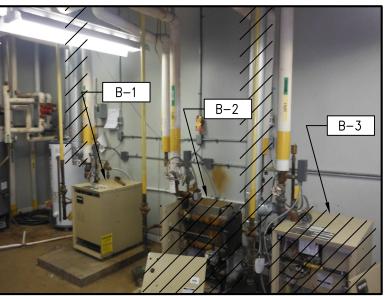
EXISTING BOILER DEMOLITION - MECHANICAL ROOM
